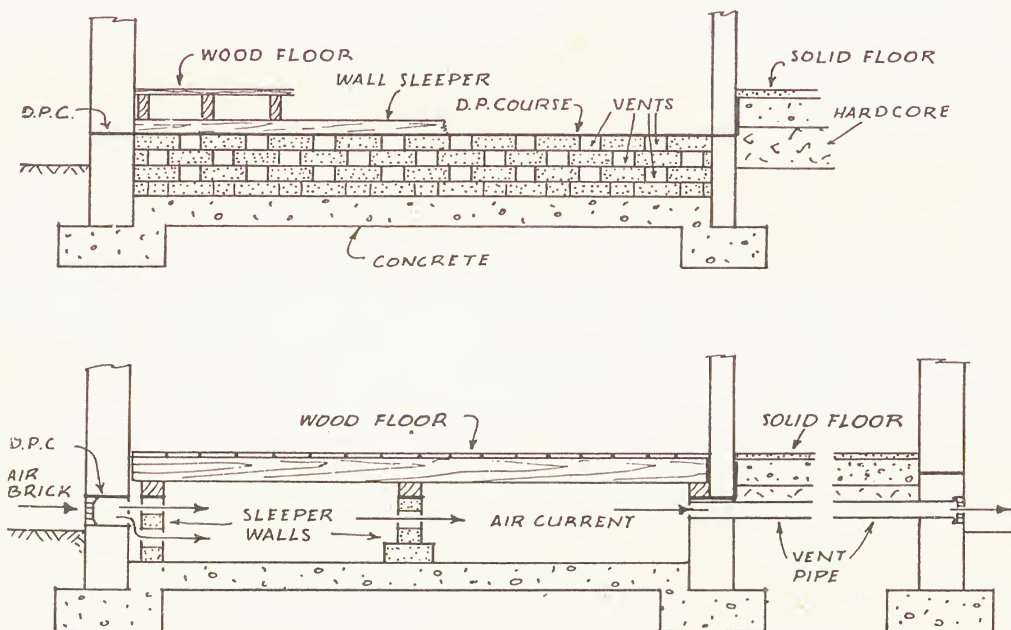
Honeycomb sleeper walls and ventilation of wood floors. Top drawing shows sleeper wall in elevation. Bottom drawing shows section through sleeper walls and vent pipe under solid floor.
